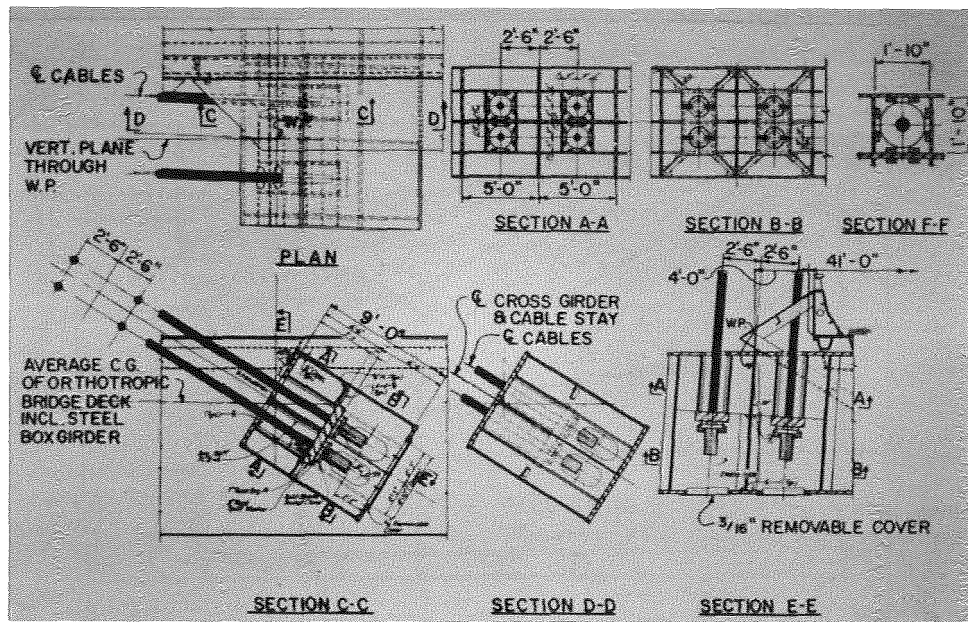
Luling Bridge, detail at stay attachment to girder, from reference 22.
